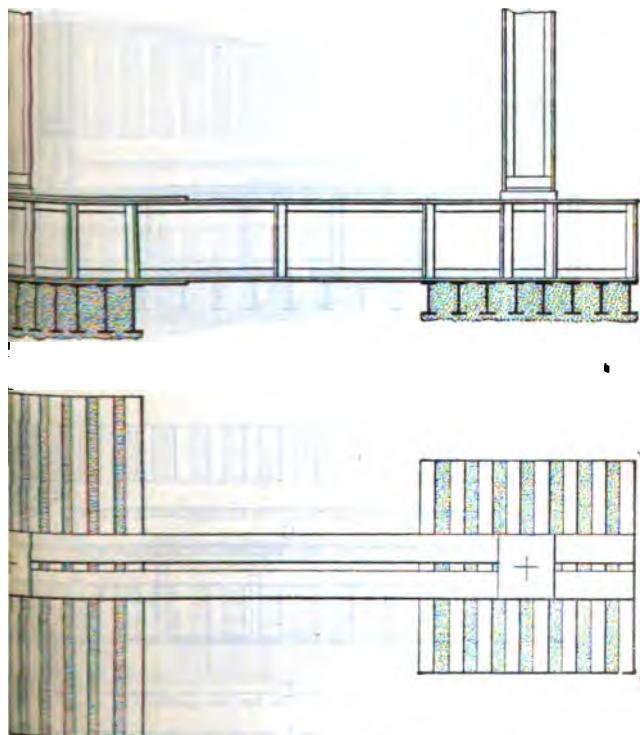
Cantilever Foundation. Grillage Fulcrum
